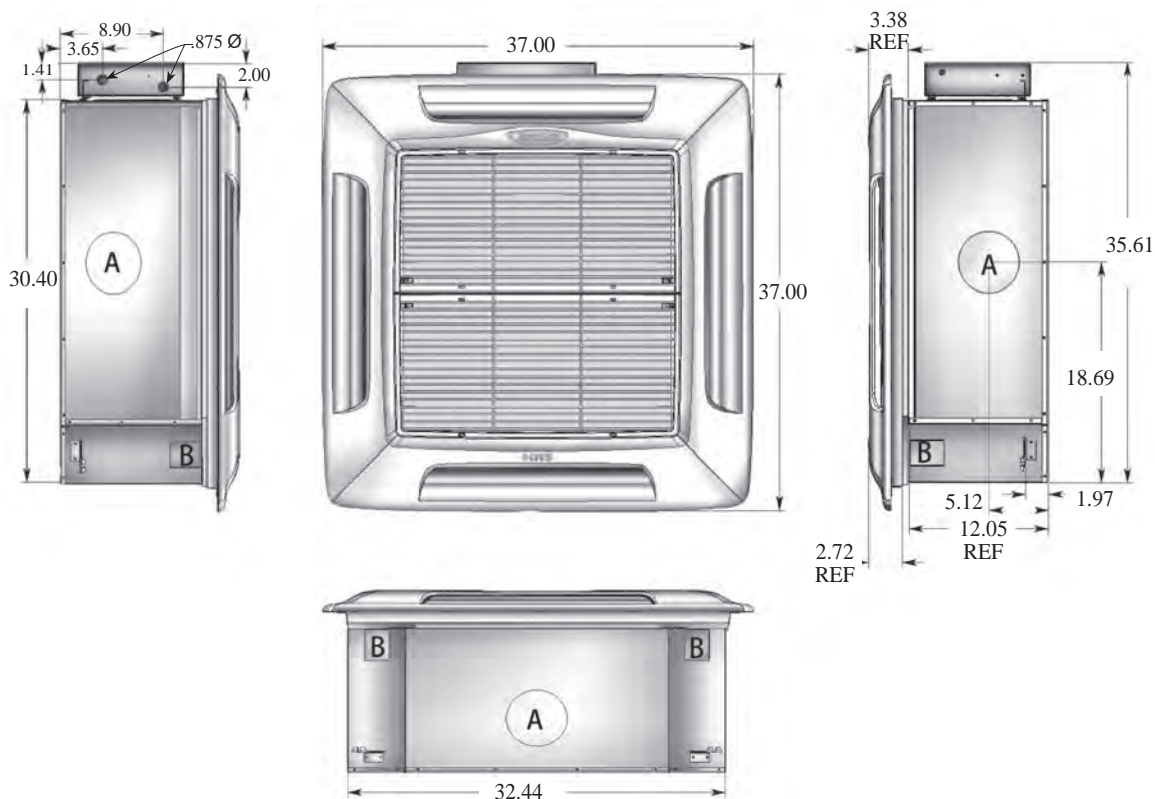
CACG/CAHG/CACH/CAHH ductless air handlers — dimensions, openings and knockouts
